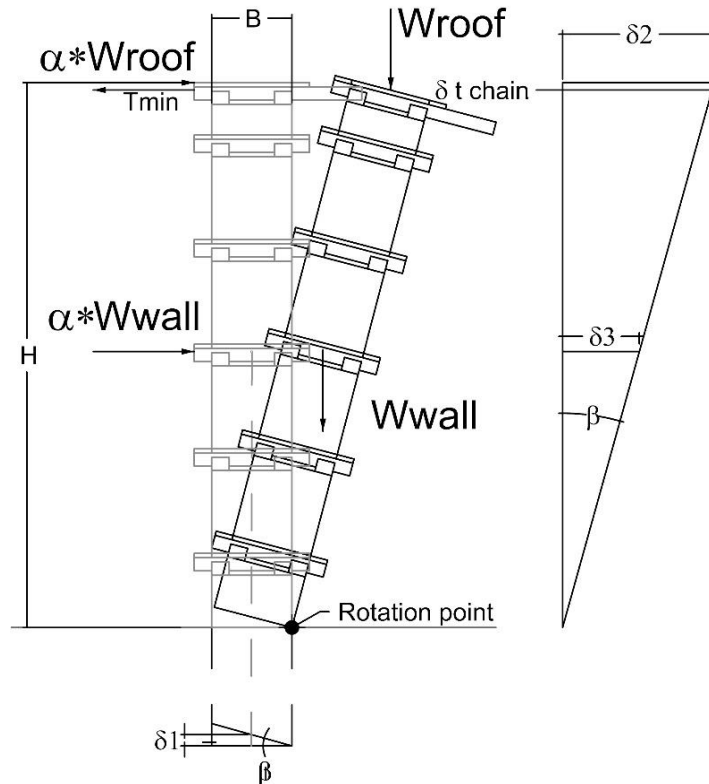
Roof force + Wall force - Overturning Wall - Tmin
